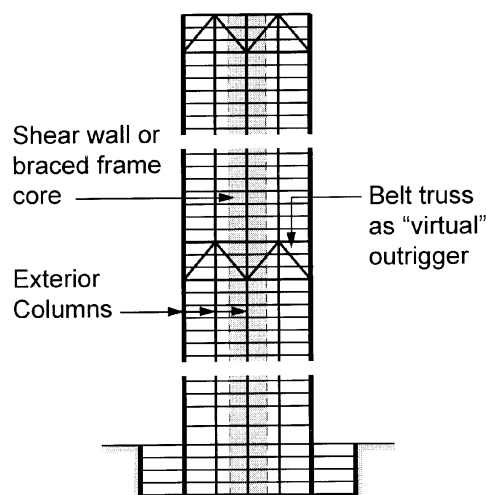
Tall building with belt trusses as “virtual” outriggers.
